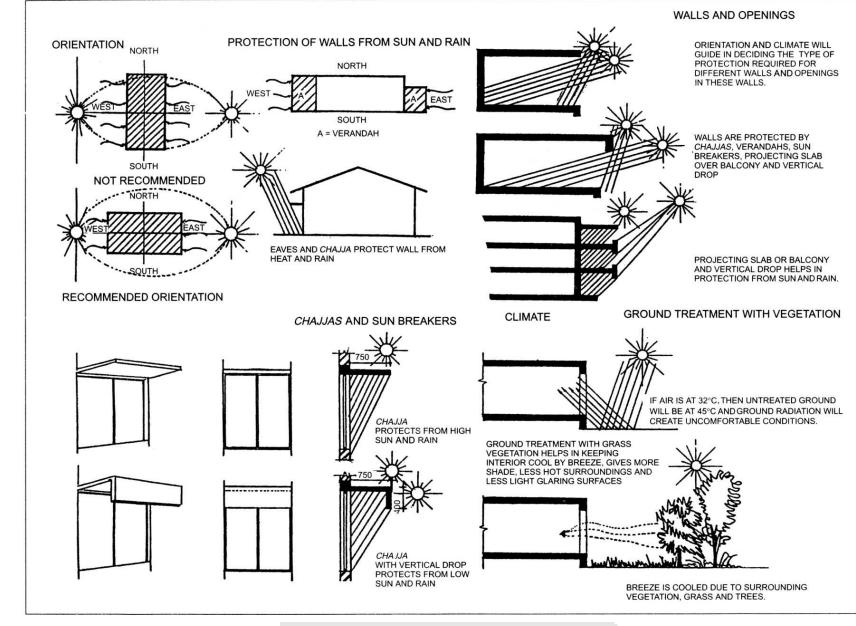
Design Considerations for Orientation, Walls and Openings
